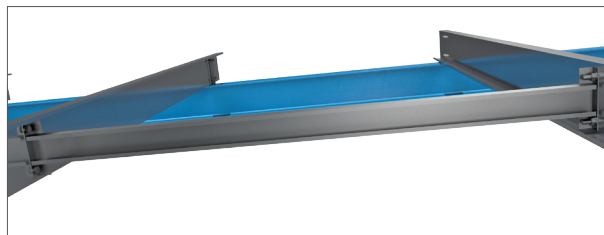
Detail of a purlin strut made of 100 mm high C section (HCS)
